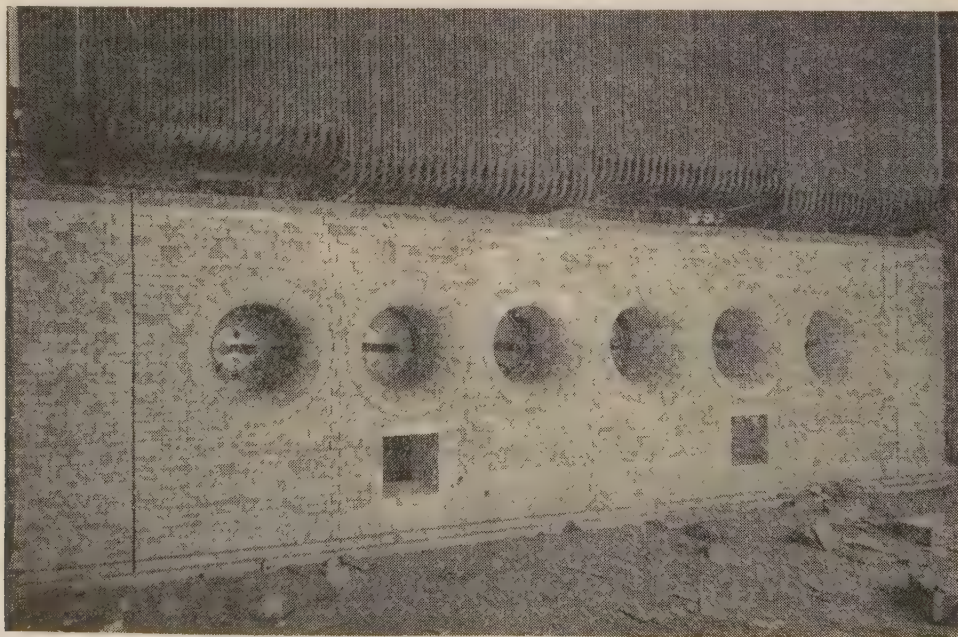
SIX HORIZONTALLY MOUNTED FUEL-OIL BURNERS
